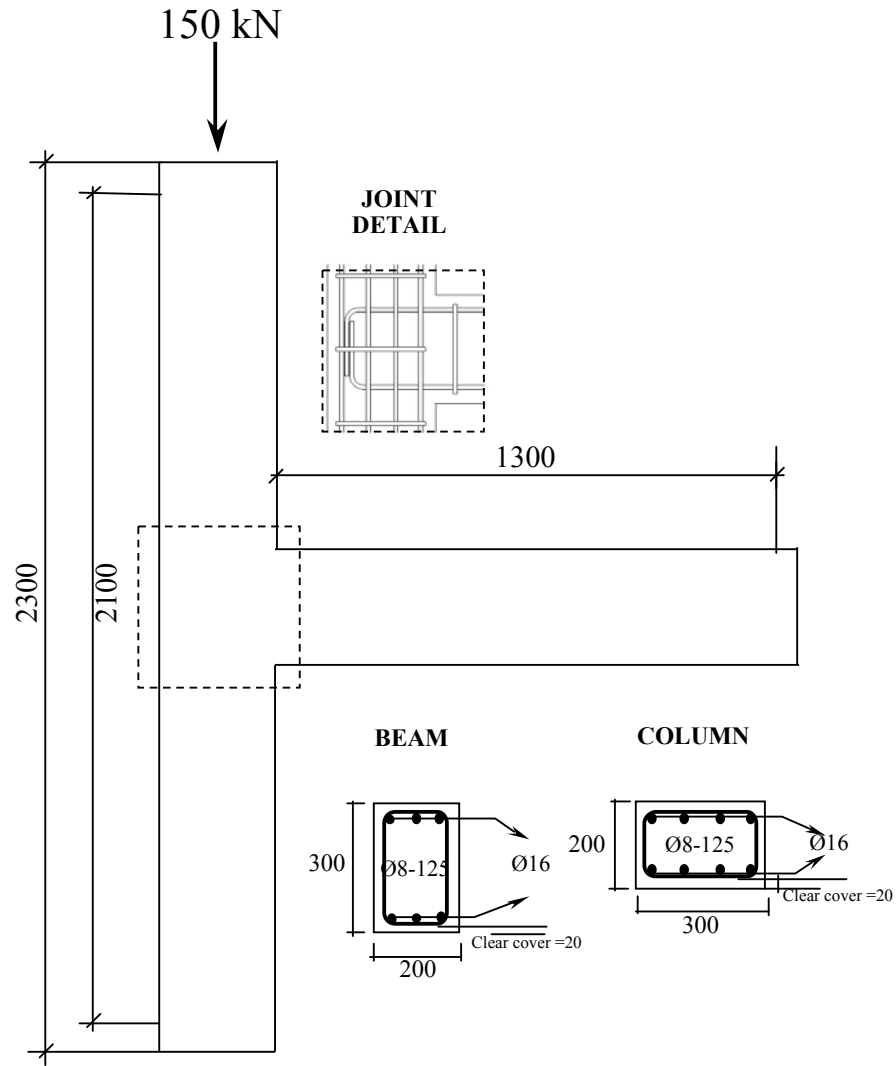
Joint dimensions and details used in the design example, unit in mm
